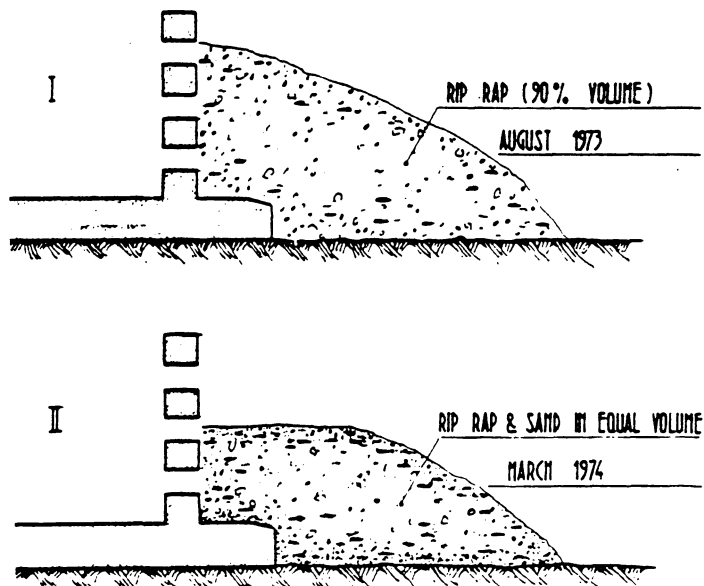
Rip-rap around Ekofisk platform as observed after its installation
